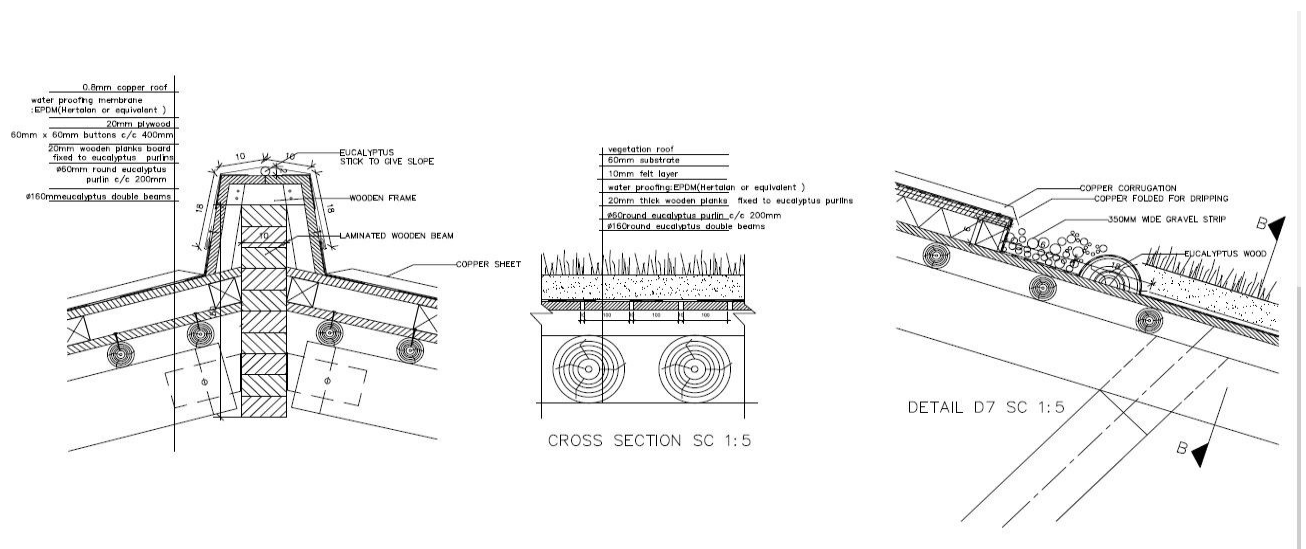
Section drawing, showing various construction details of the green roof of the gulele HOAREC building. Source: ABBA architects plc.
